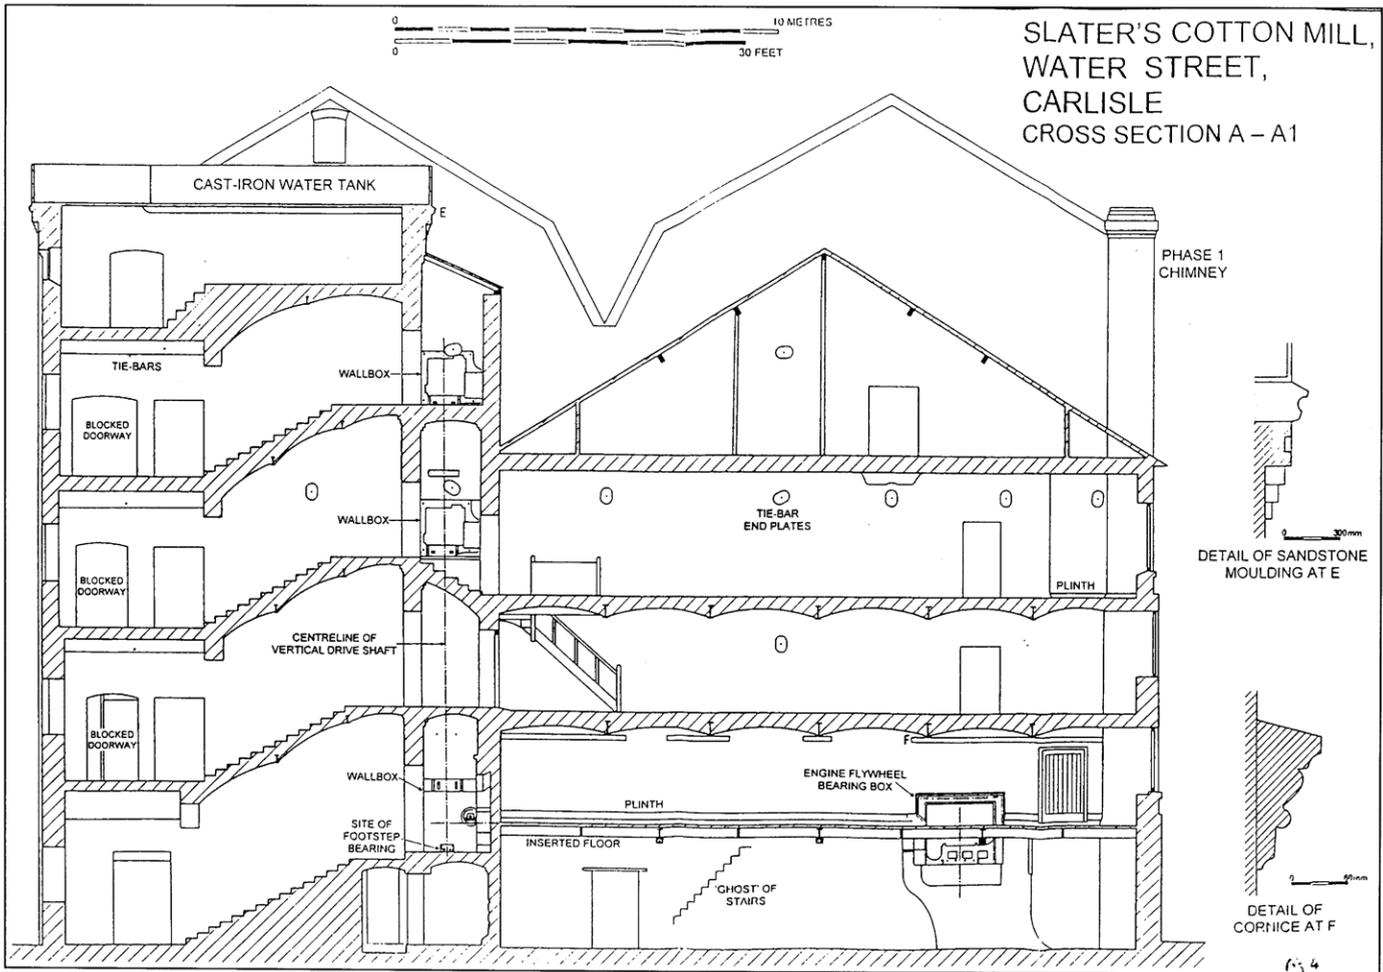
Slaters Cotton Mill, Water Street, Carlisle: Cross Section A-A1.
